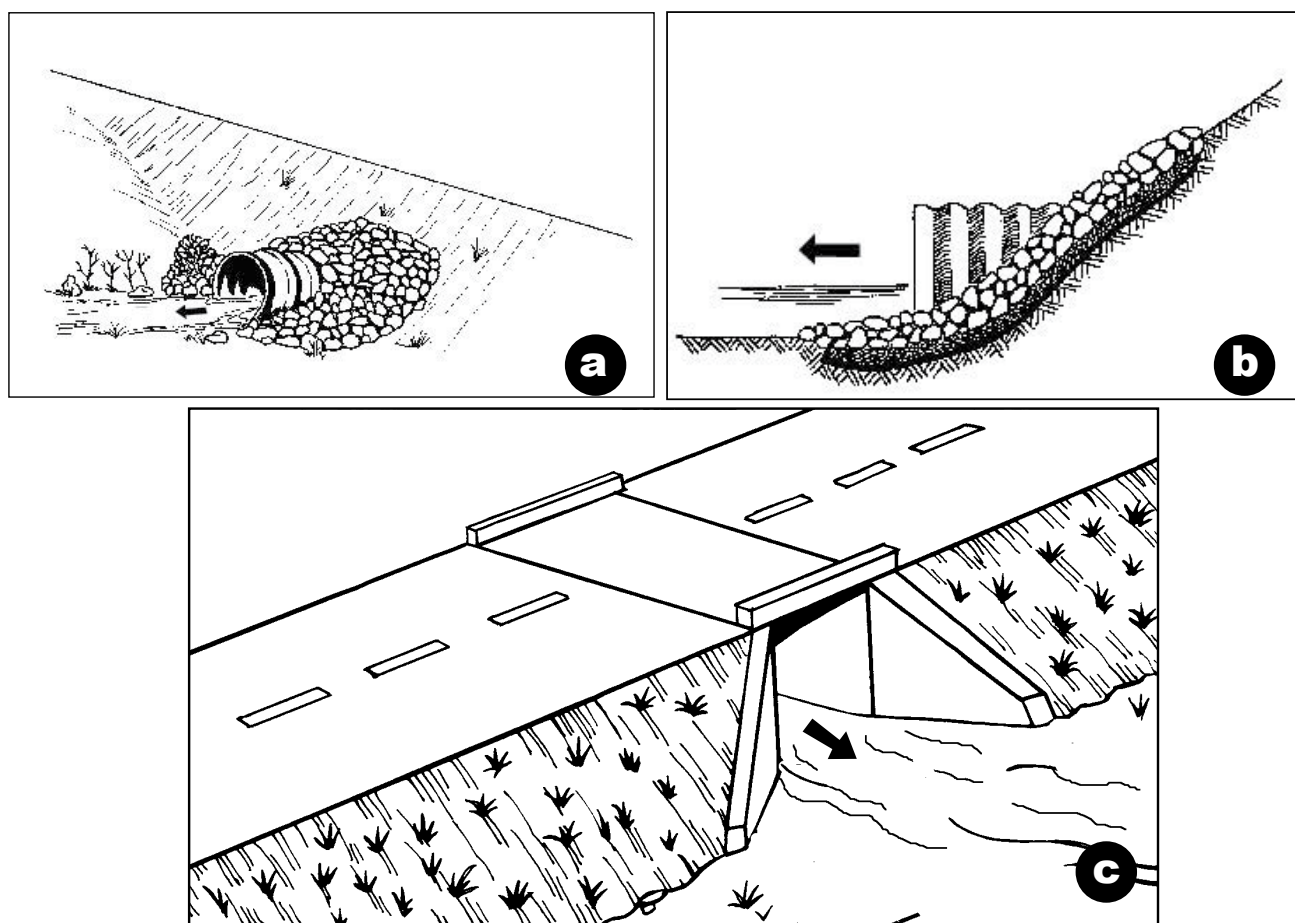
Armoring and protection of a culvert pipe fill using riprap (a) (b) or concrete headwalls and wingwalls (c).
